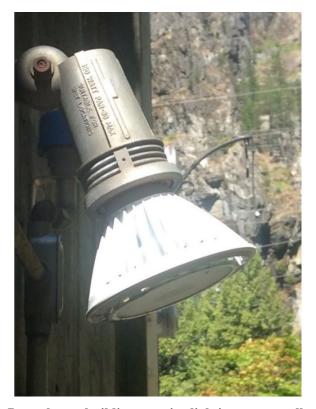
Gorge Powerhouse building exterior lighting – east walkway (close-up view).
